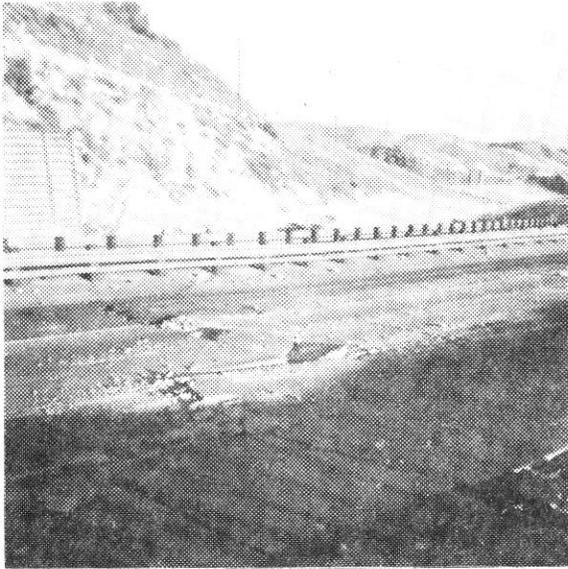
Looking easterly at pavement damage on Route 5 north of Balboa Boulevard.
